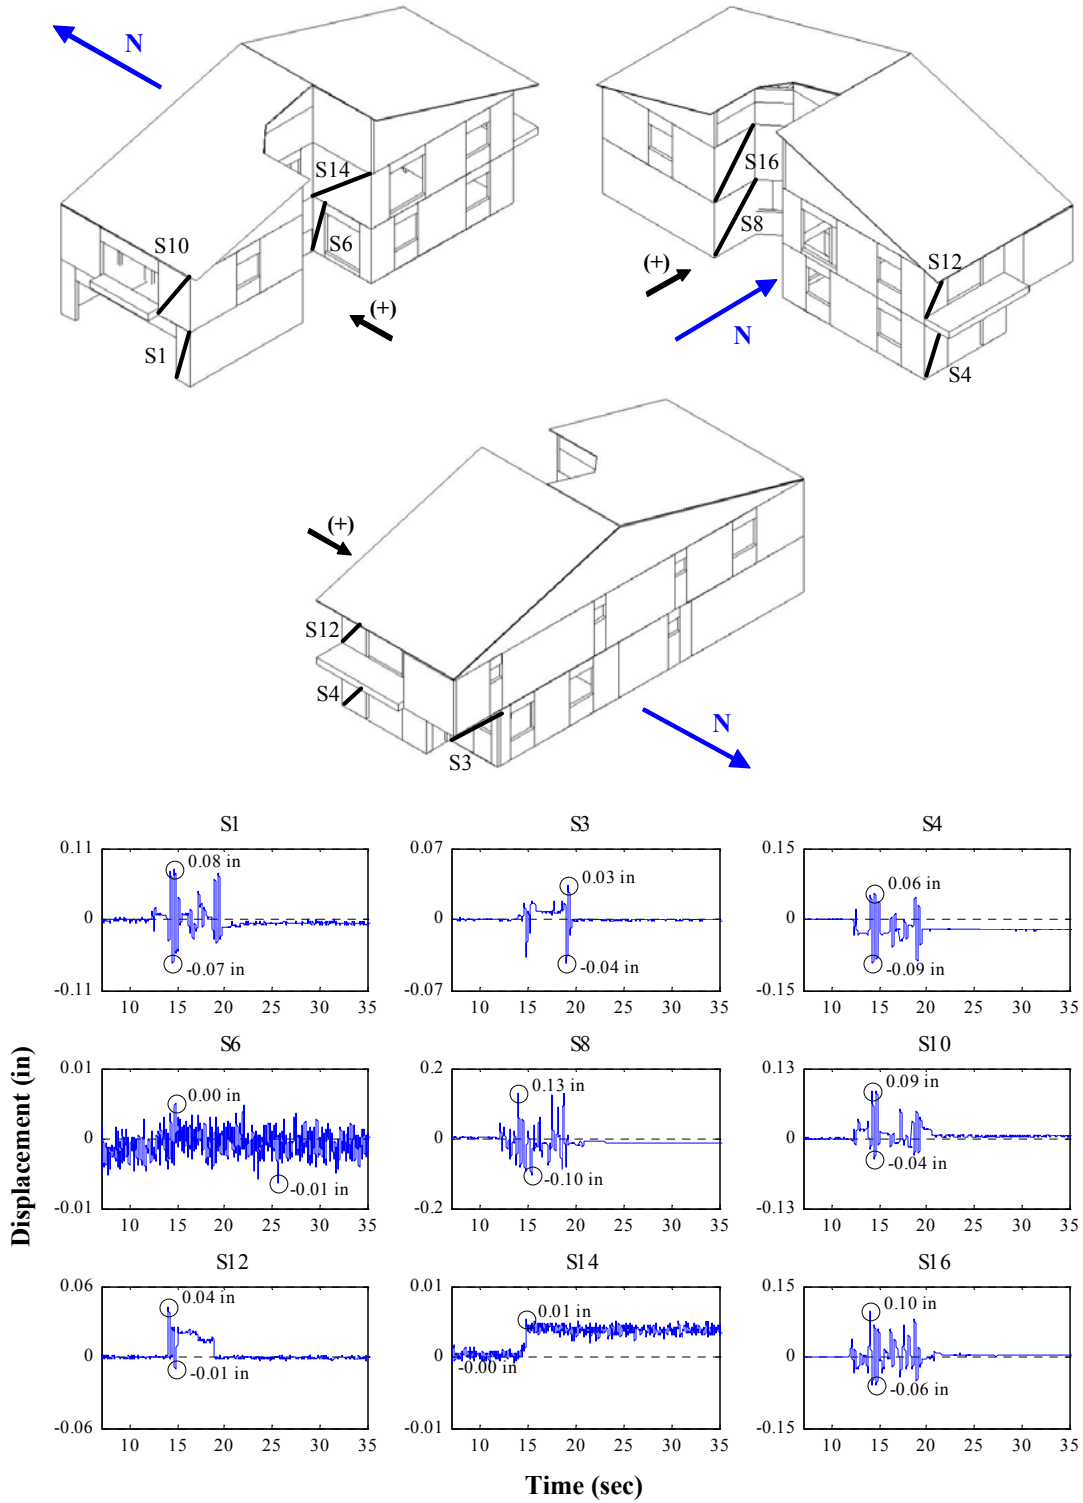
Wall deformations of north-south external walls for Test NWP2S14
